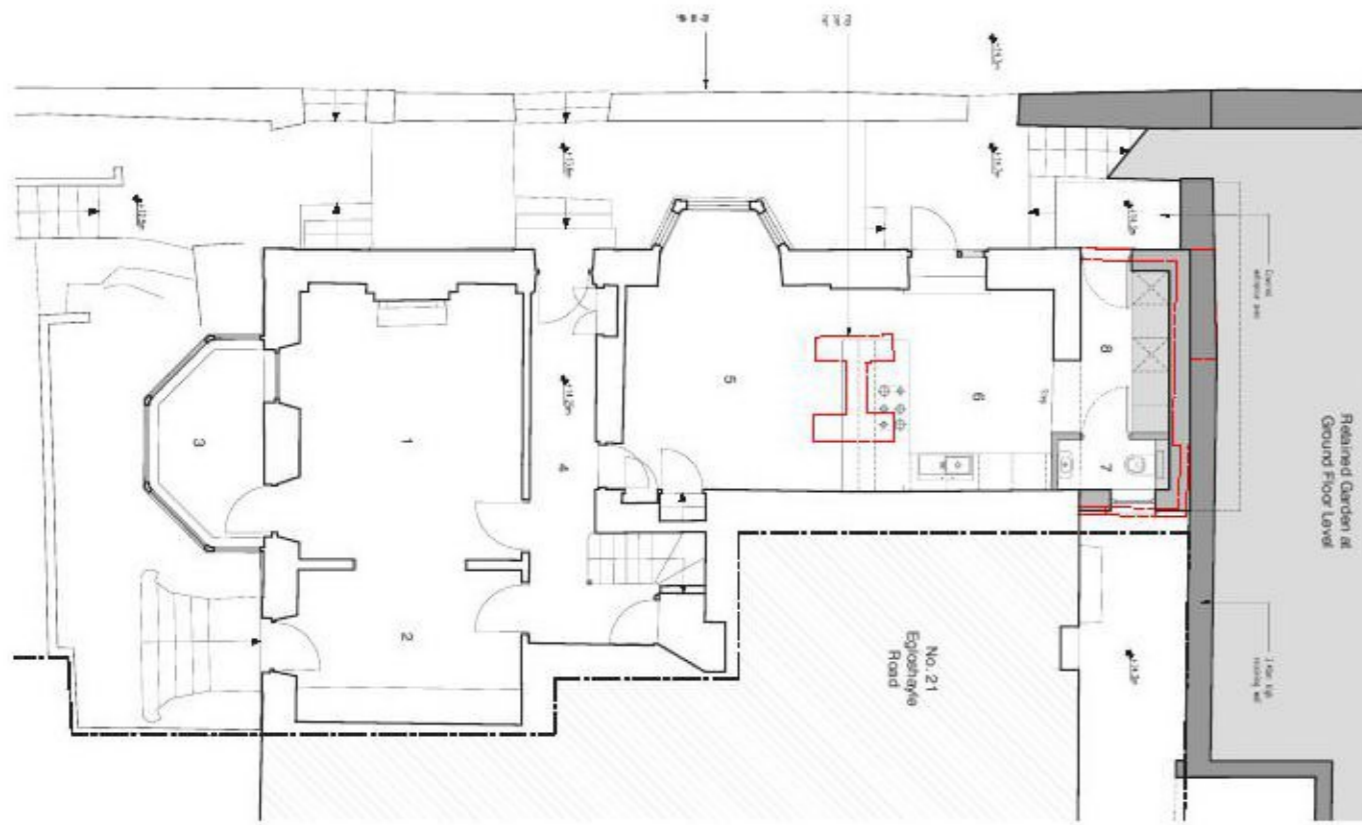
Proposed Ground Floor Plan (nts) - refer to application set for scale drawings
